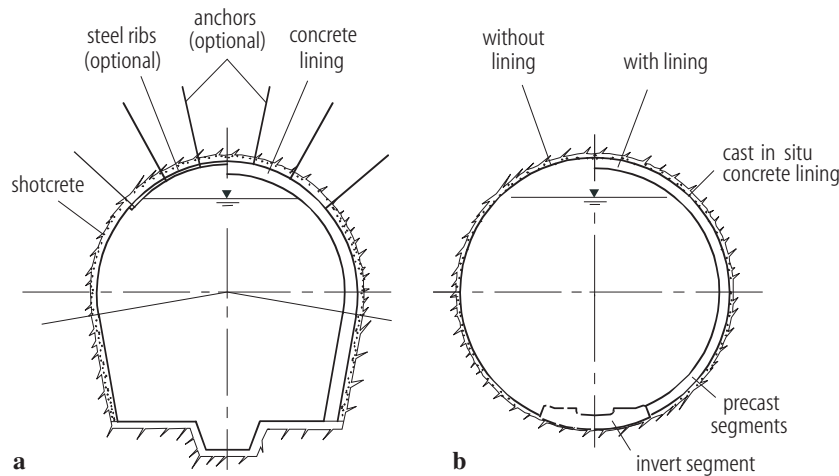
(a) Horse shoe cross section without and with cast insitu concrete lining. (b) Circular cross section by TBM with and without lining (cast insitu concrete or precast segments).
